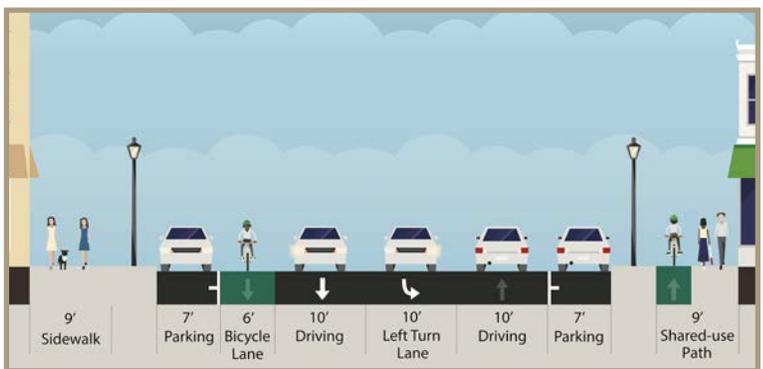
Looking south on Center Street at South Avenue, proposed conditions.
